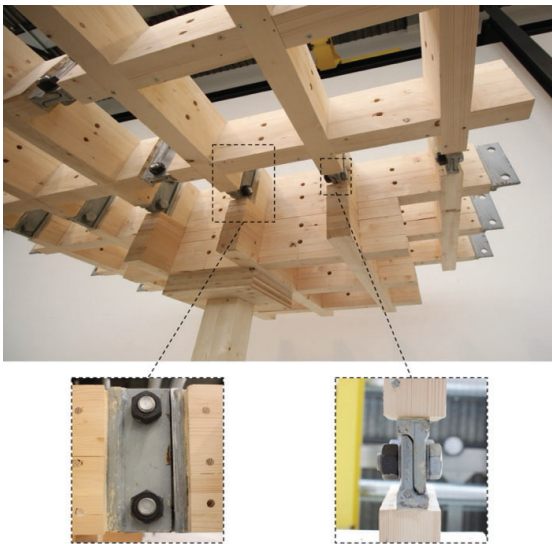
Full-scale prototype of the Pixel Slab solution and connection details between beams.
